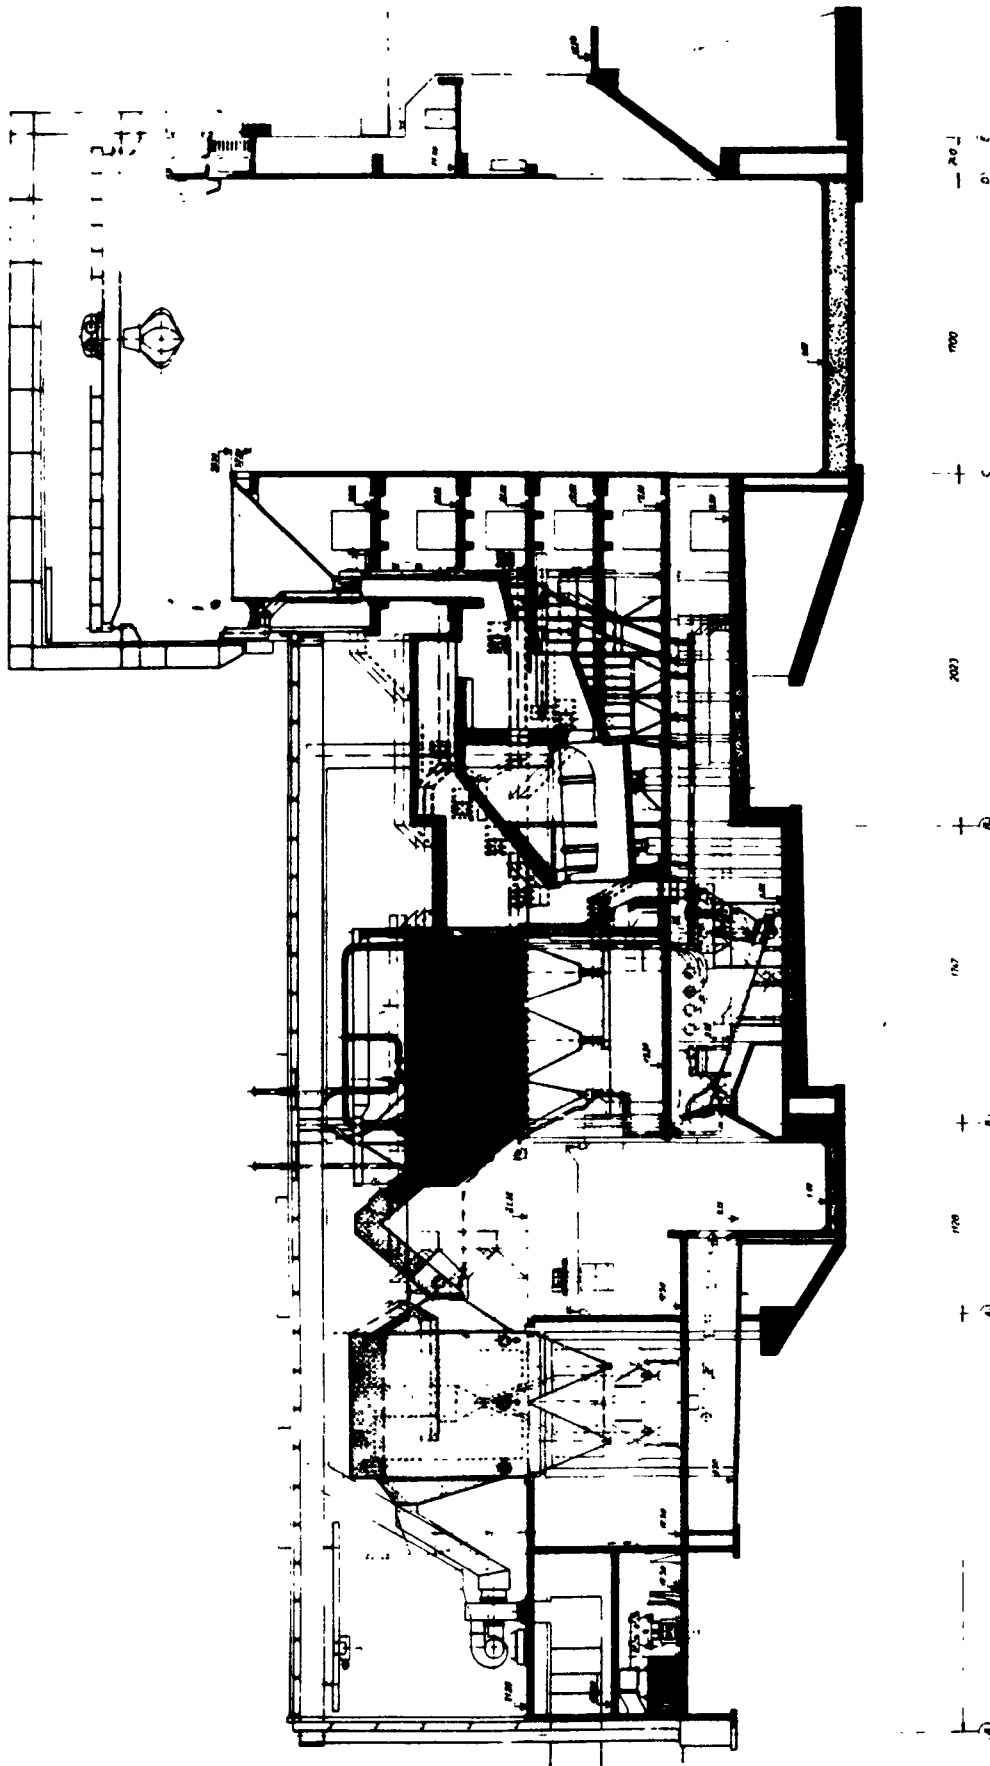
CROSS-SECTIONAL ENGINEERING DRAWING OF COPENHAGEN: WEST RFGS
